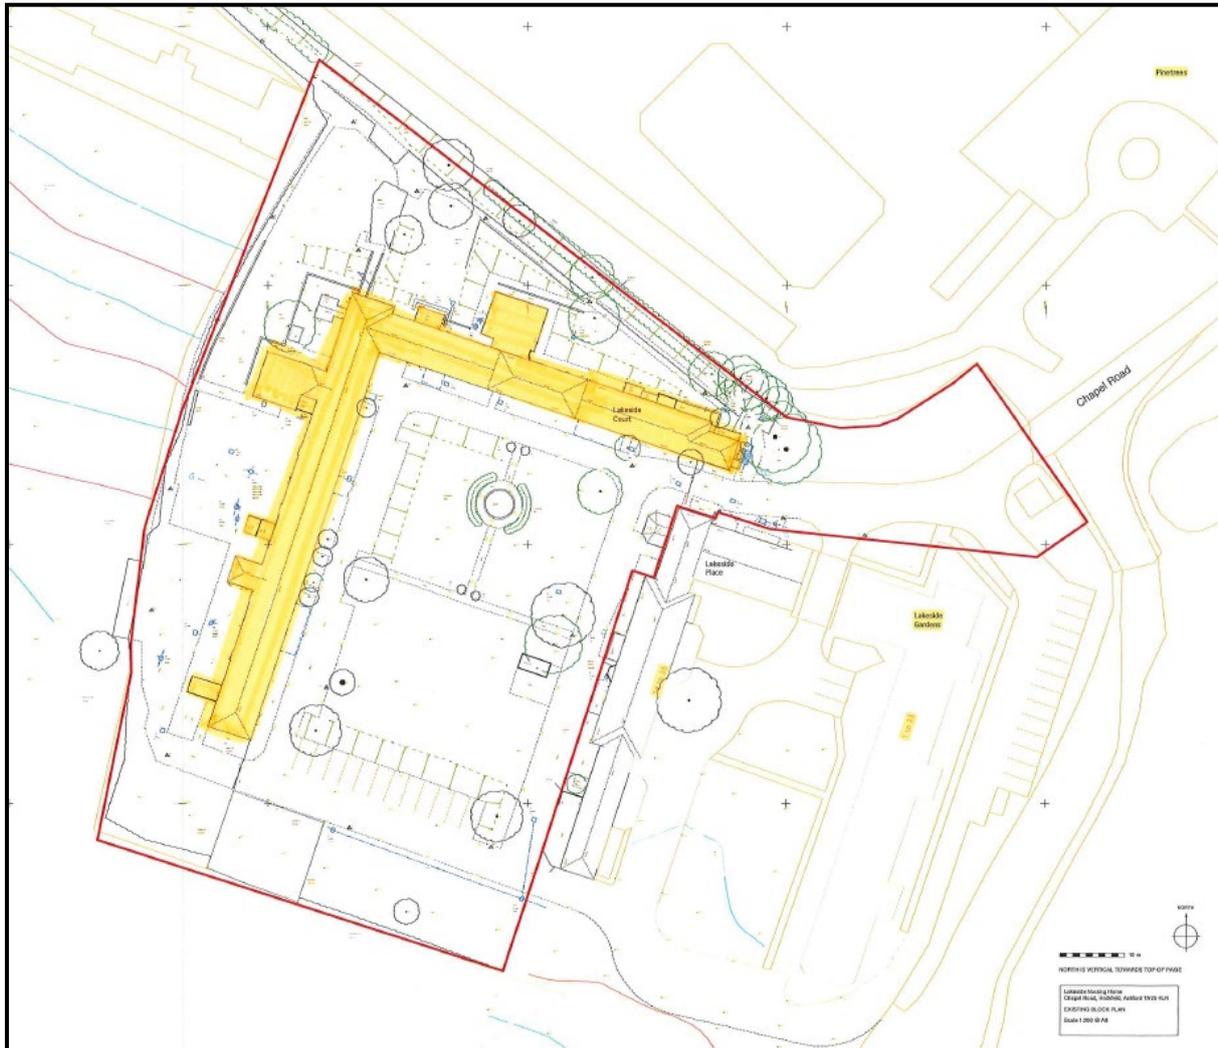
Existing block plan (yellow denotes existing wing to be demolished)
